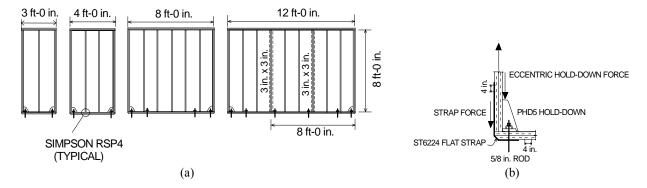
Panel framing layout specifications: (a) 3-ft, 4-ft, 8-ft, and 12-ft panels; (b) end-post detail.
